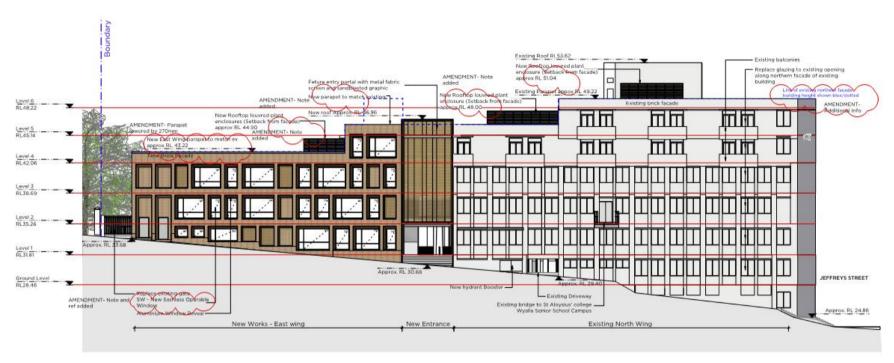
| North Elevation – Upper Pitt Street (Source: PMDL, 2018)
